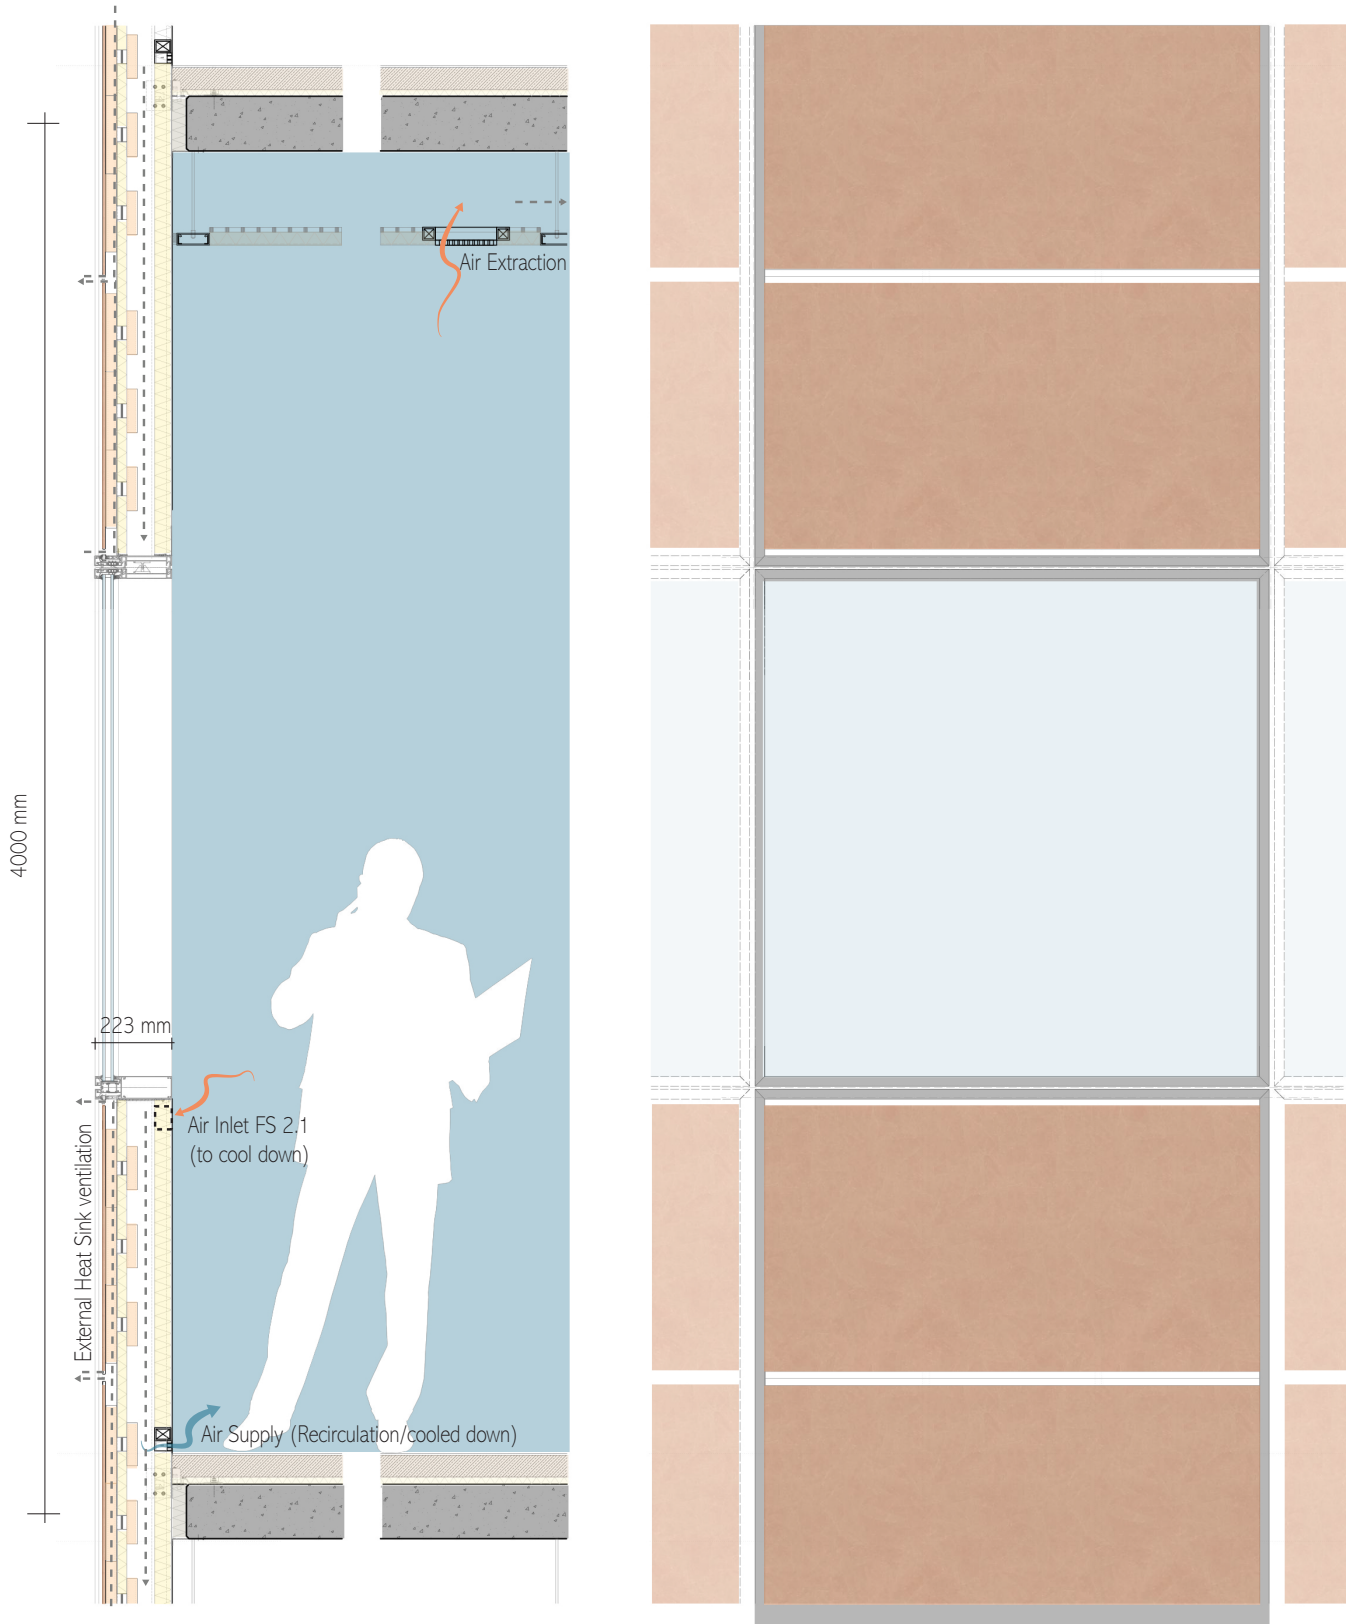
Left: Façade section with air outlet and extraction; right: exterior elevation
